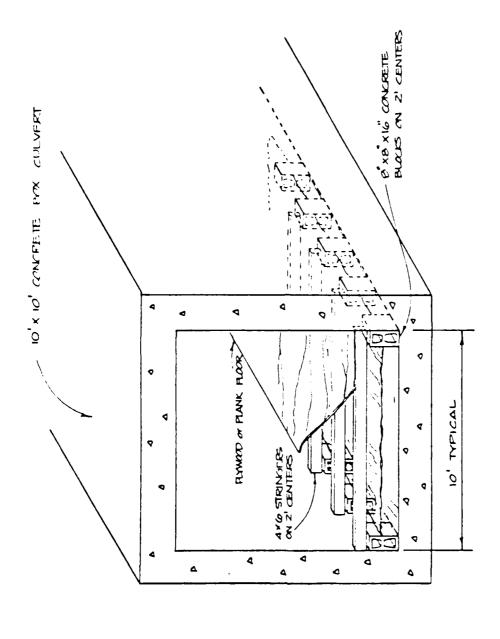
Box Culvert Host Area Shelter With Low-Flow False Floor.
